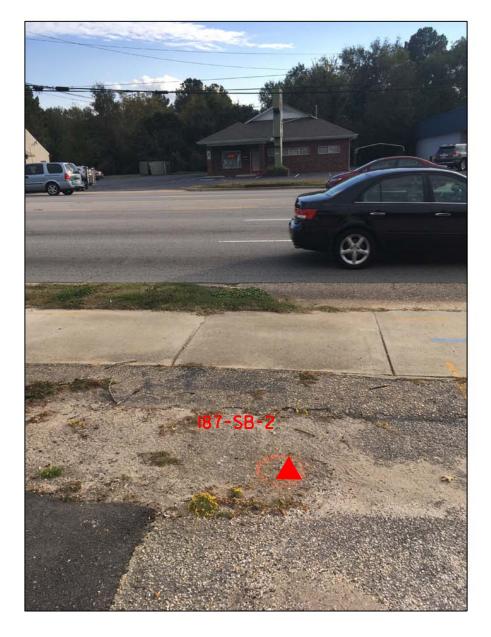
VIEW OF SOIL BORING LOOKING SOUTH PHOTO 4 - VIEW OF SOIL BORING LOOKING WEST
